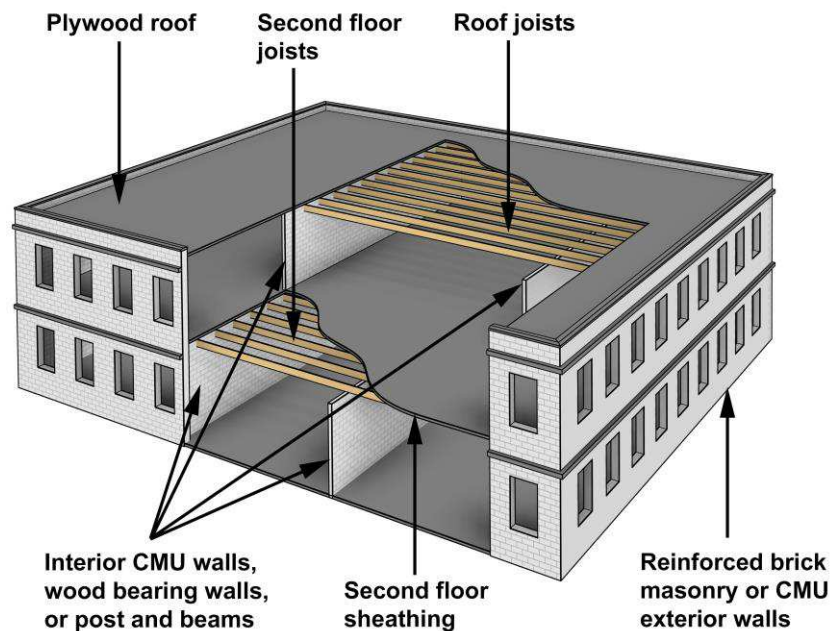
Schematic illustration of a RML building (Figure adapted from FEMA 547, FEMA, 2006)
